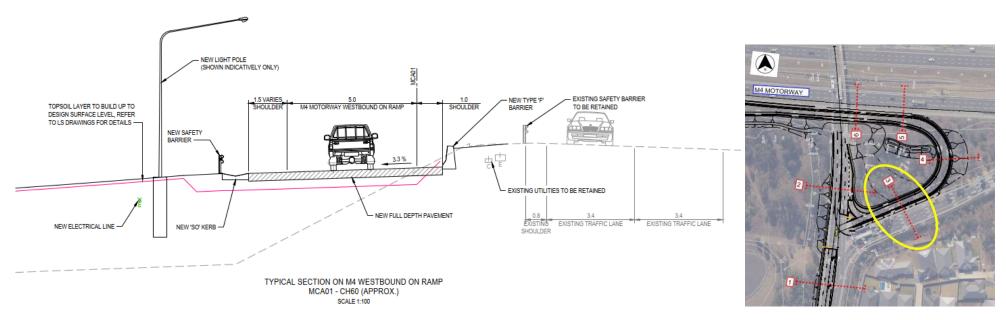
Typical cross section (looking north east) of the proposed westbound on-ramp (G-loop). Includes new Type F barrier
